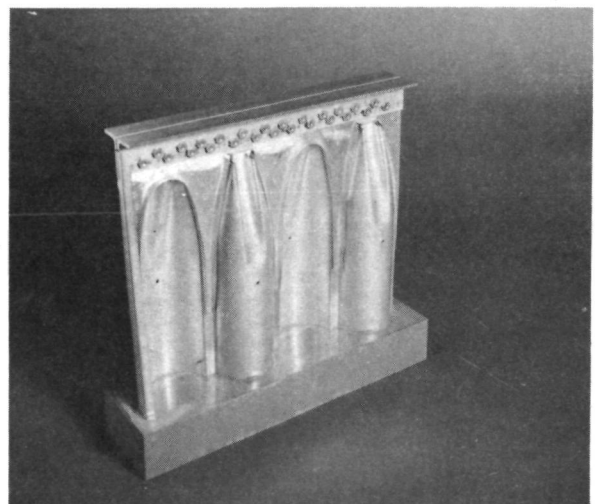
FAILED END CLOSURE AXIAL COMPRESSION TEST SPECIMEN
